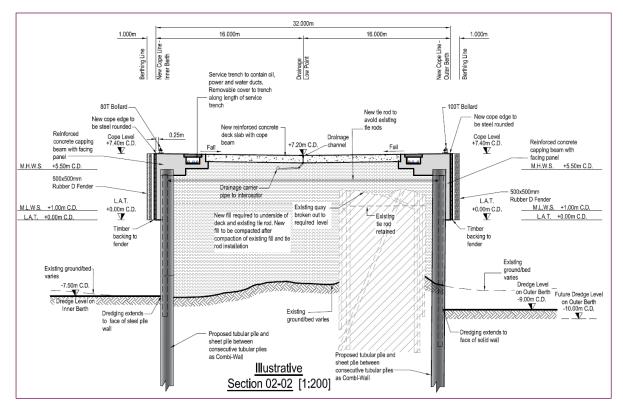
Typical Section Through Outer Structure Showing Existing Structure Encased by New Structure
